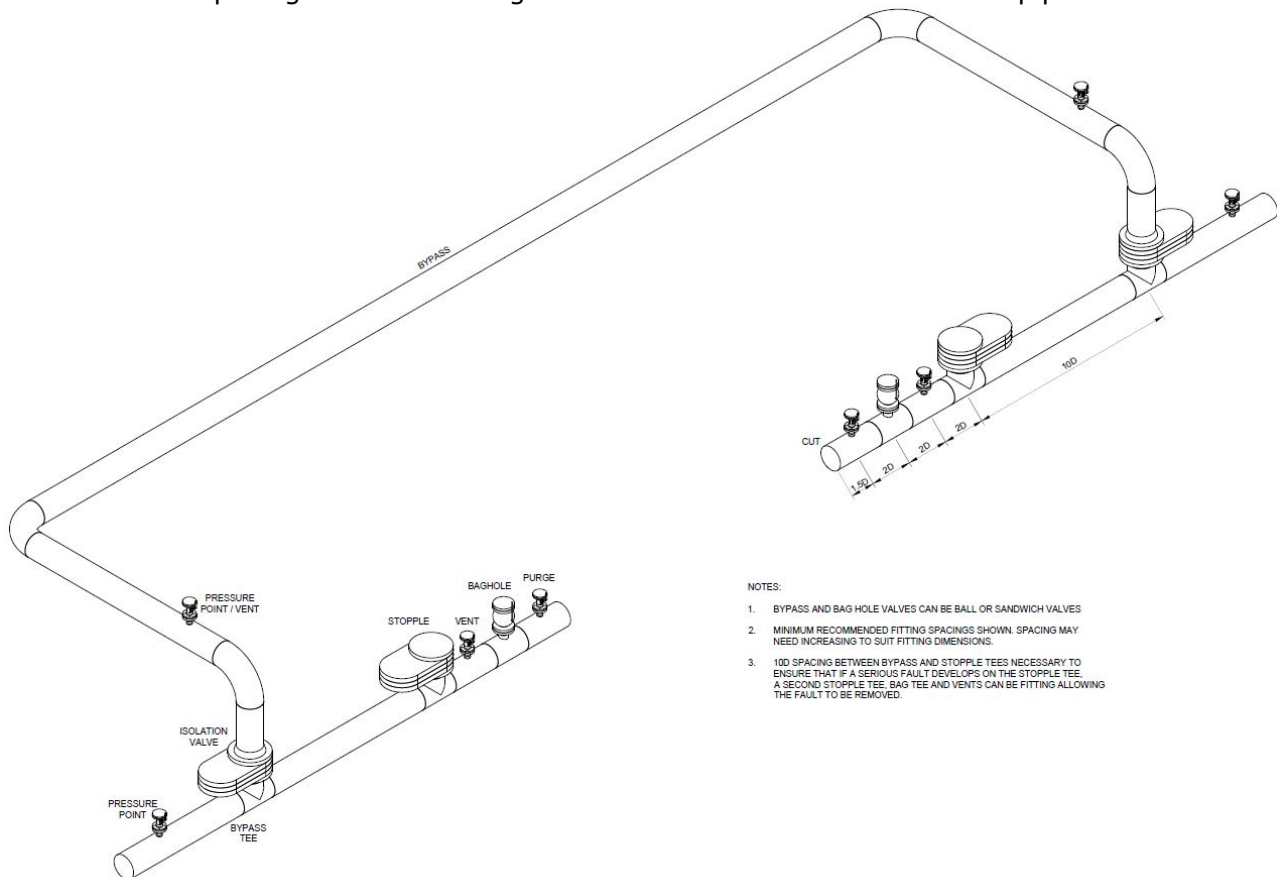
TYPICAL ARRANGEMENT OF A TWO-POSITION STOPPLE WITH BYPASS
